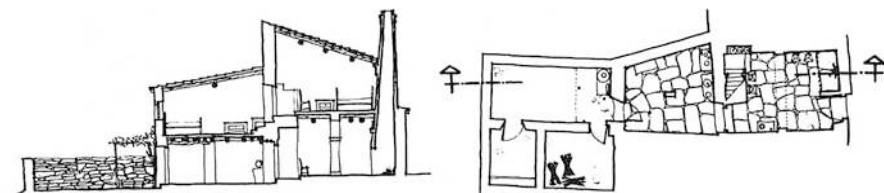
Reguengos de Monsaraz: floor plan and section (AAP 1961)
